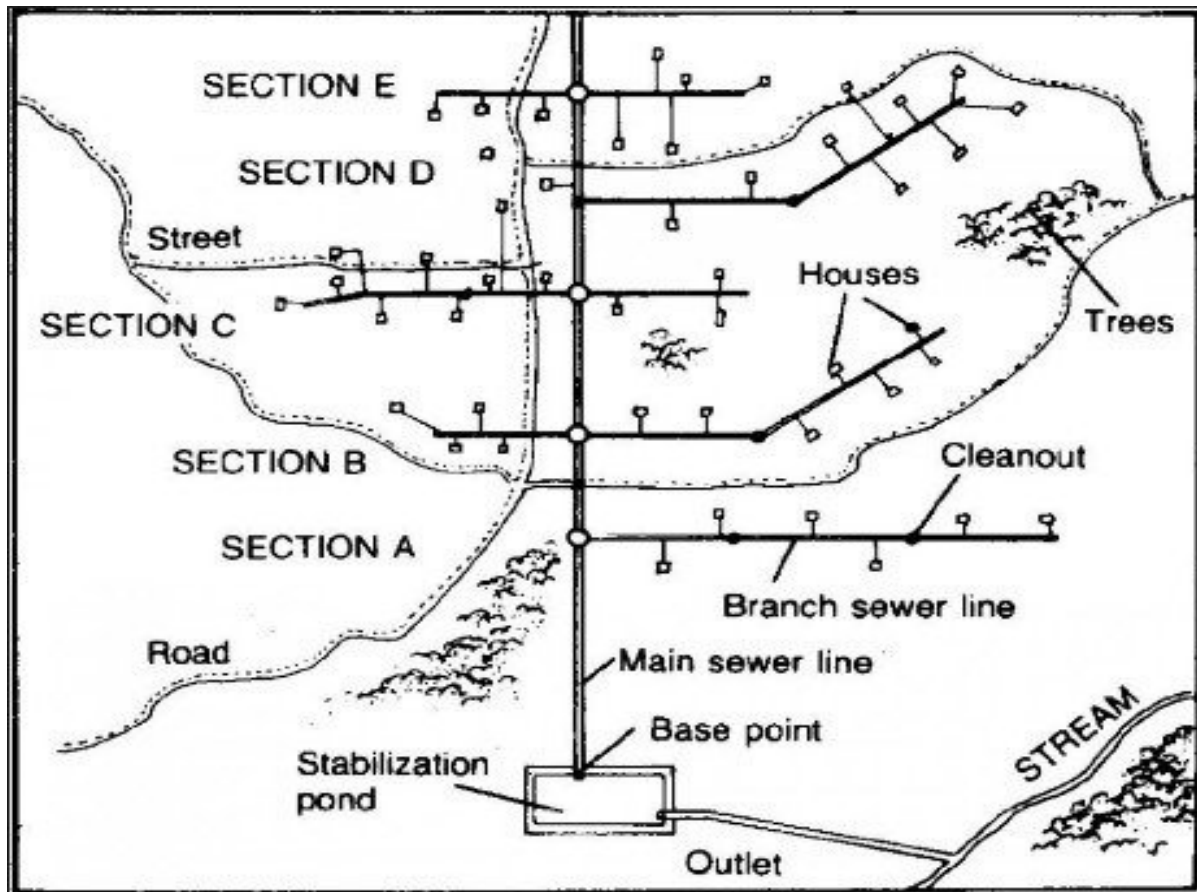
Sewer Sanitary System Layout, Source: <https://theconstructor.org/building/set-up-sewer-sanitary-system-layout/17956/> [accessed on 12th May, 2018]
